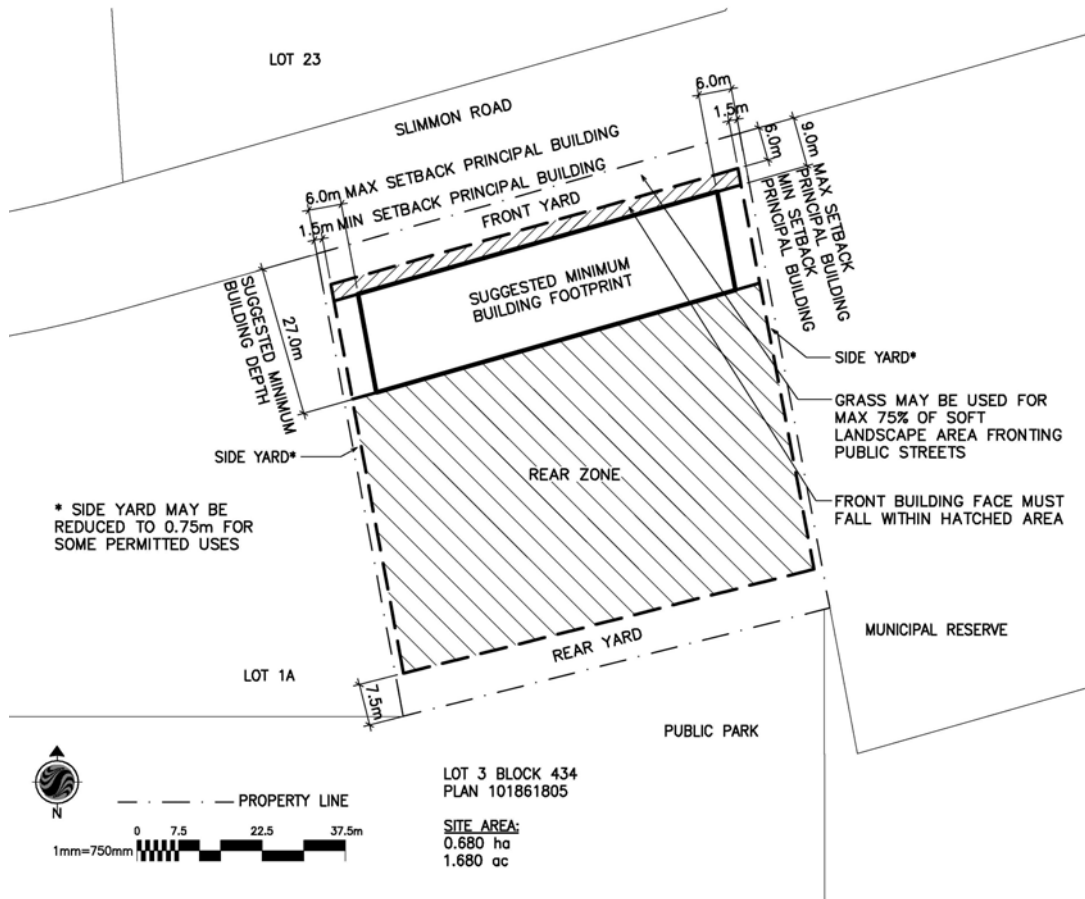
Range of Multi-Unit Apartment Building Positions for 230 Slimmon Road
